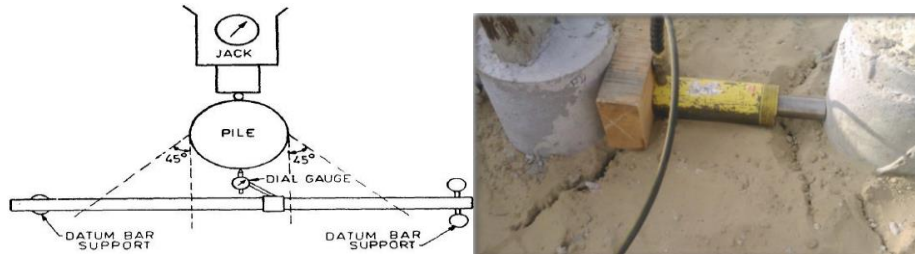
Test arrangement for lateral load test on pile. Sketch on left is a schematic of the test setup. Photo on right shows test in progress.
